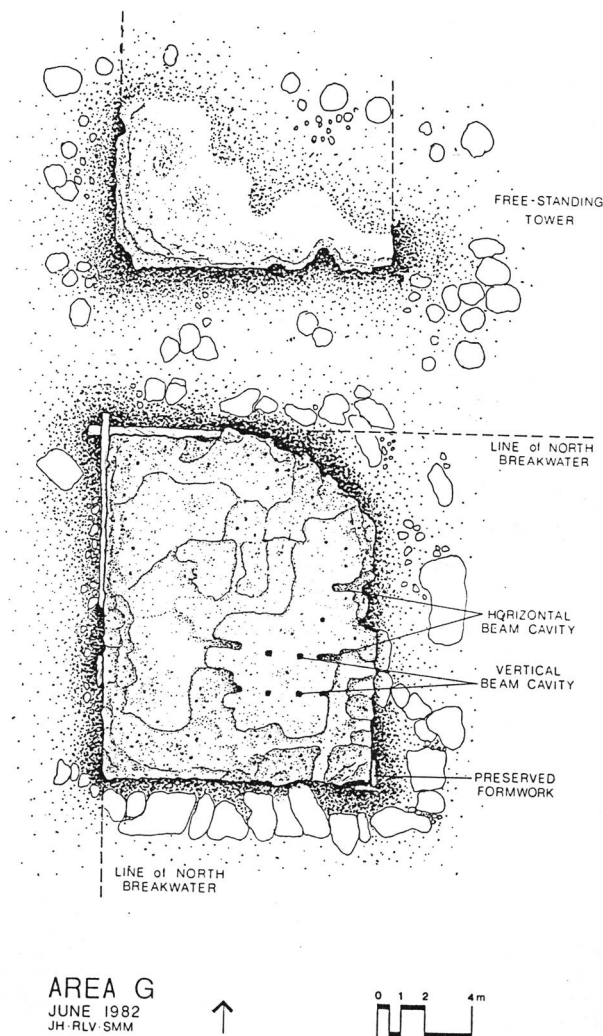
Area G: Top plan (Raban 1989, Fig. III.50)
